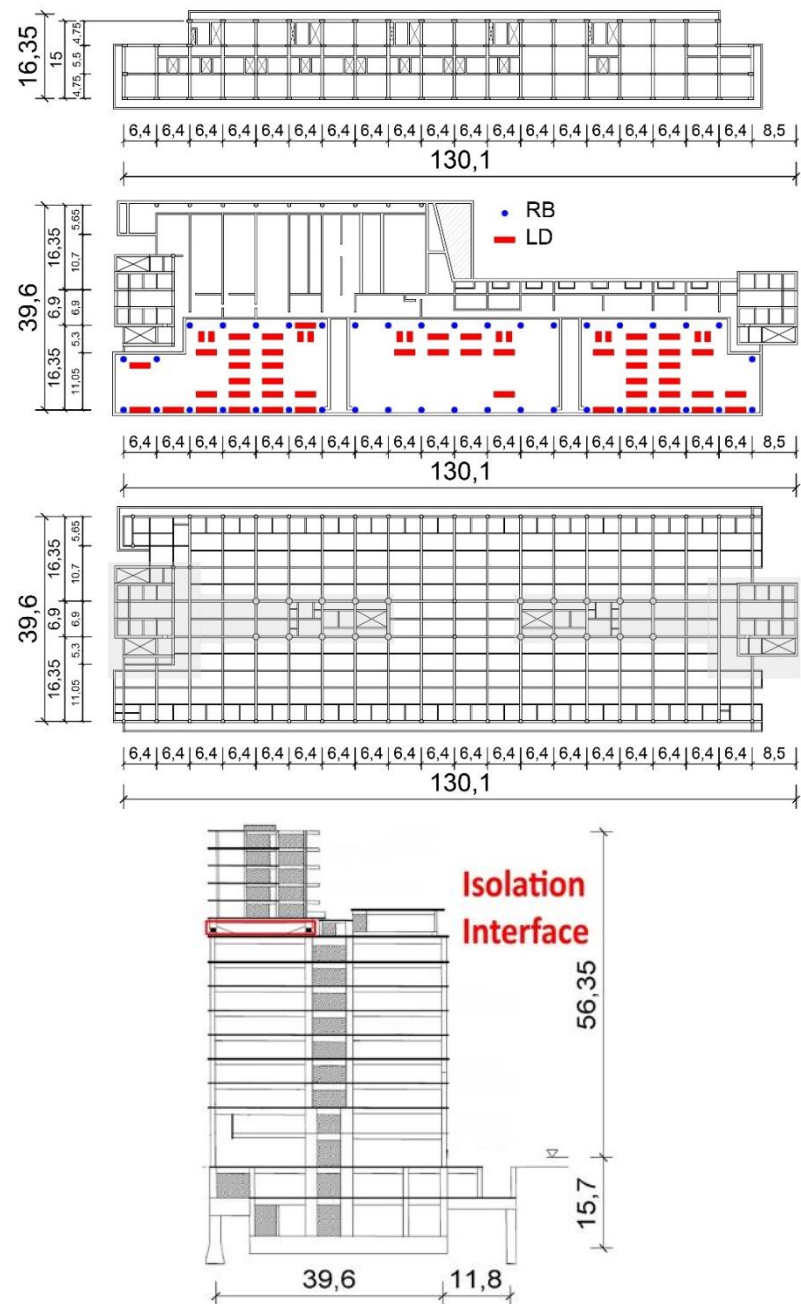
Iidabashi 1<sup>st</sup> building: Plans and Sections (a) upper typical floor, (b) isolation floor, (c) lower typical floor, (d) Transversal section (dimension in meters) [redrawn from Murakami et al. 2000, Murakami 2001]
